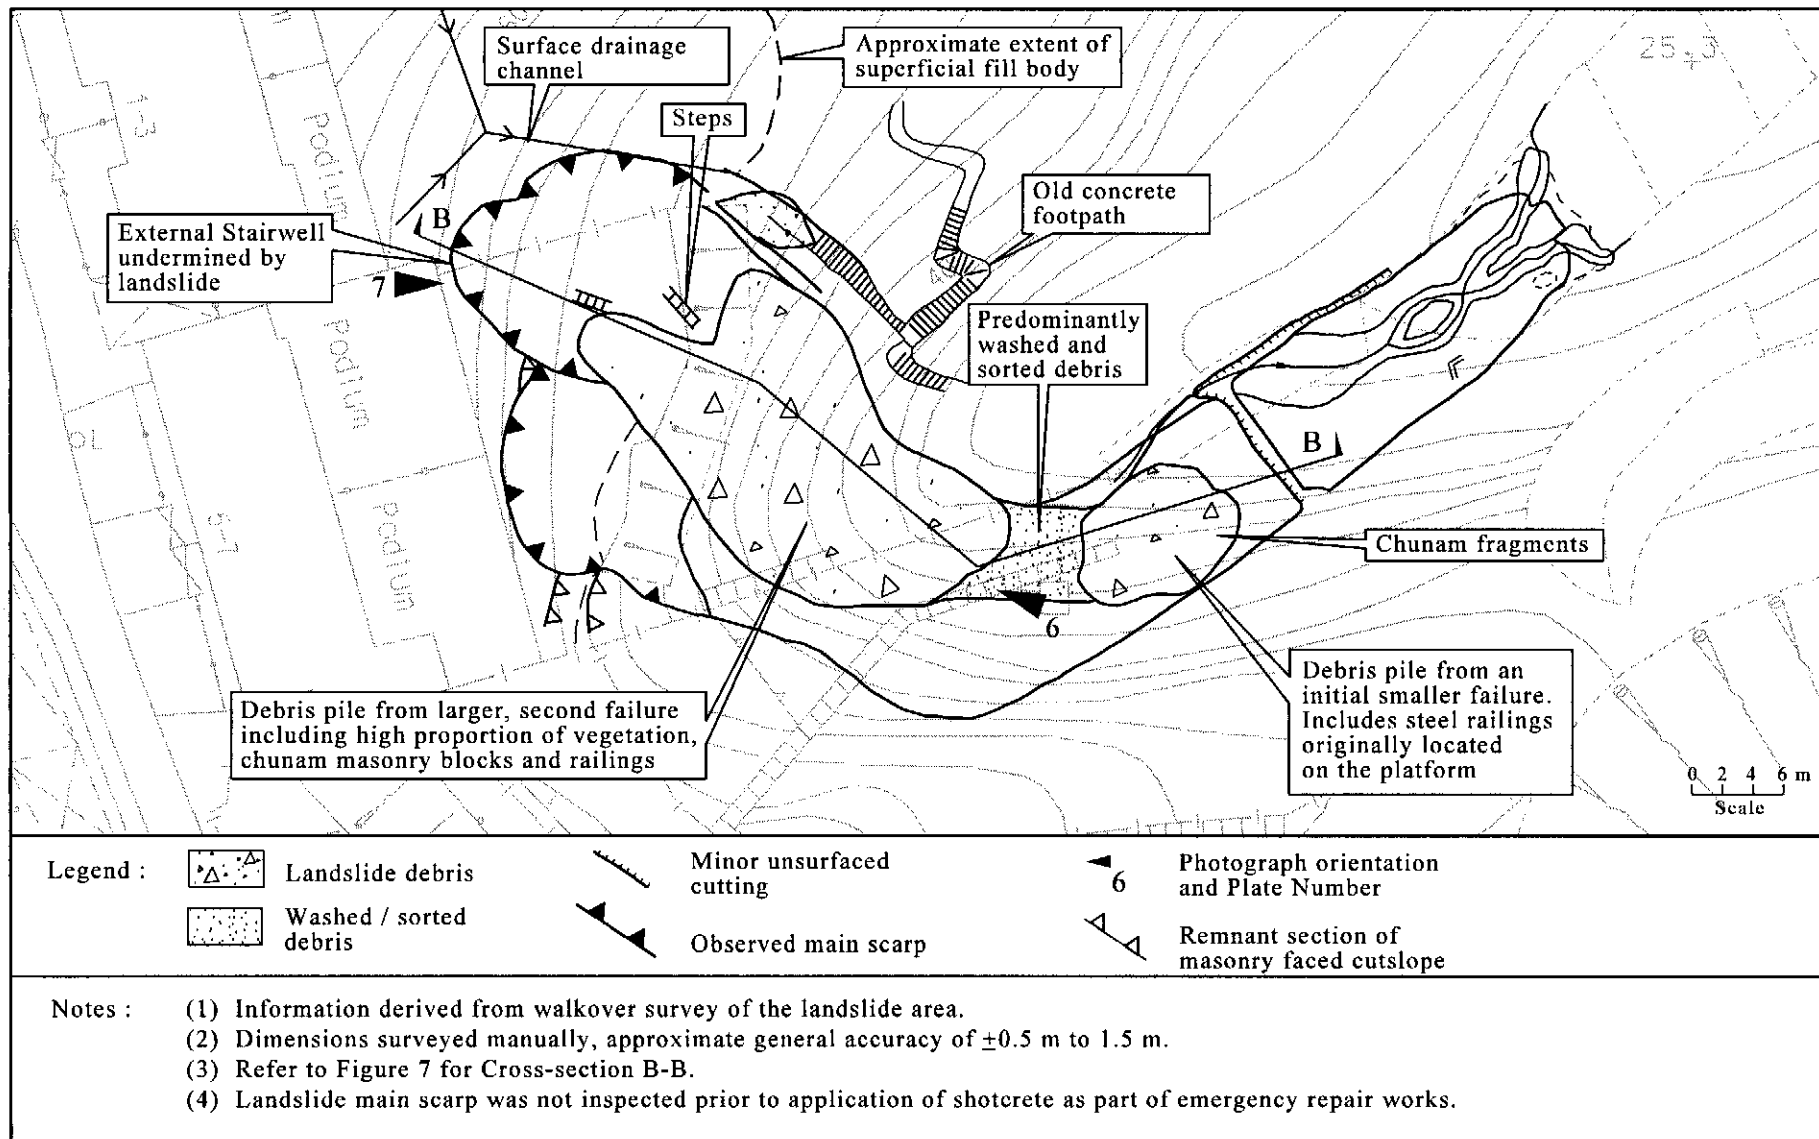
Site Location Plan and Details of the Landslide of 2 July 1997
